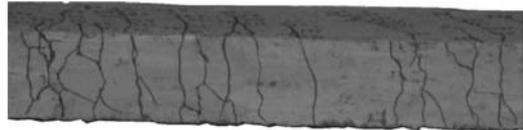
Crack pattern at the bottom of beam D5 at failure.
